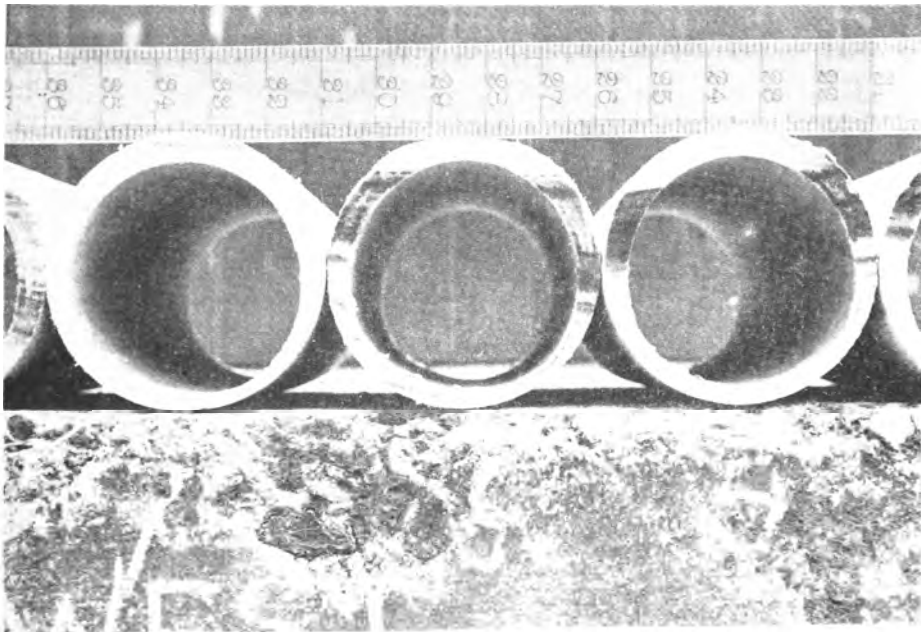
The asbestos pipe in sections for post failure measurements (Test 3)
